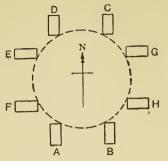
PLAN SHOWING PIERS OF DOME FROM REPORT OF AUGUST 1907.
